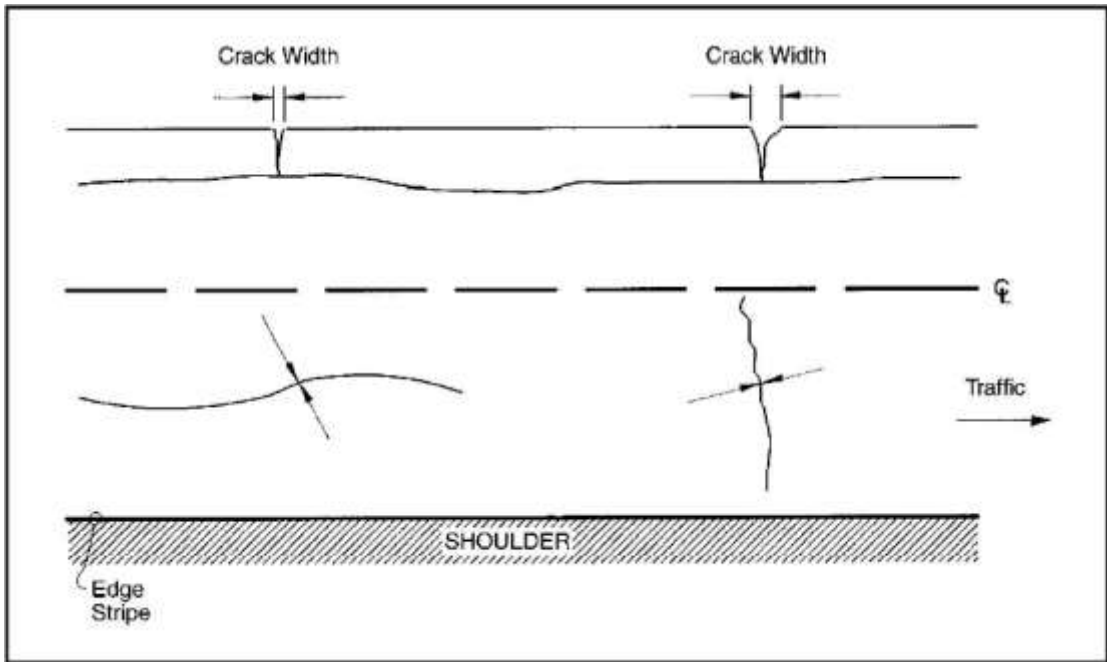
Measuring Crack Width on Asphalt Pavement (Federal Highway Administration, 2006)
